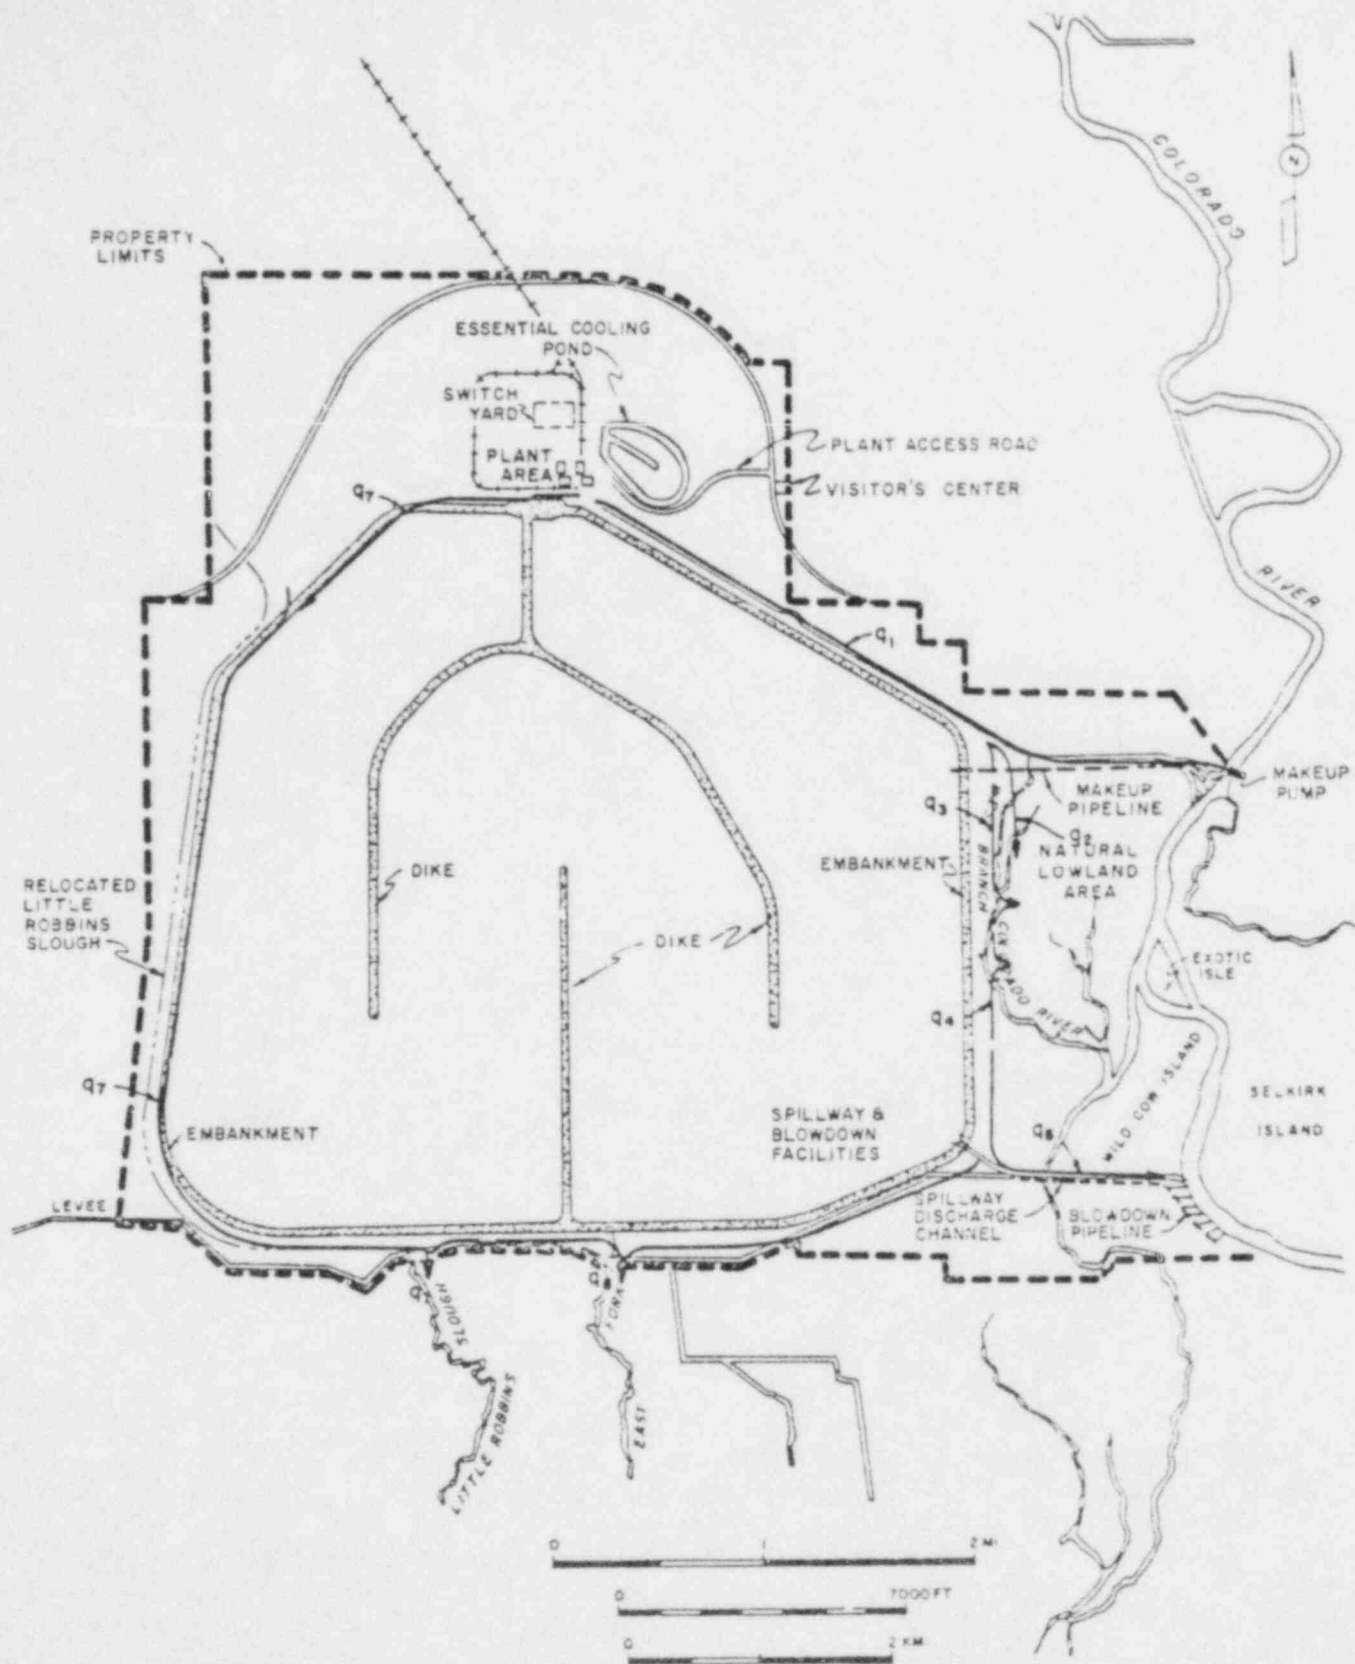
STP Plant Area (Source: Houston Power and Light 1978).
